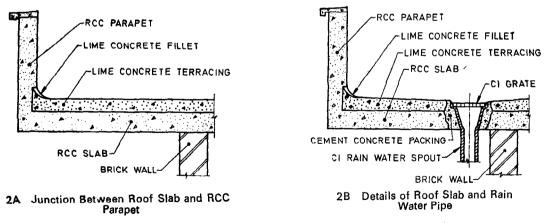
Typical Details at the Junction Between Lime Concrete Waterproofed Roof Finish and RCC Parapet Wall
